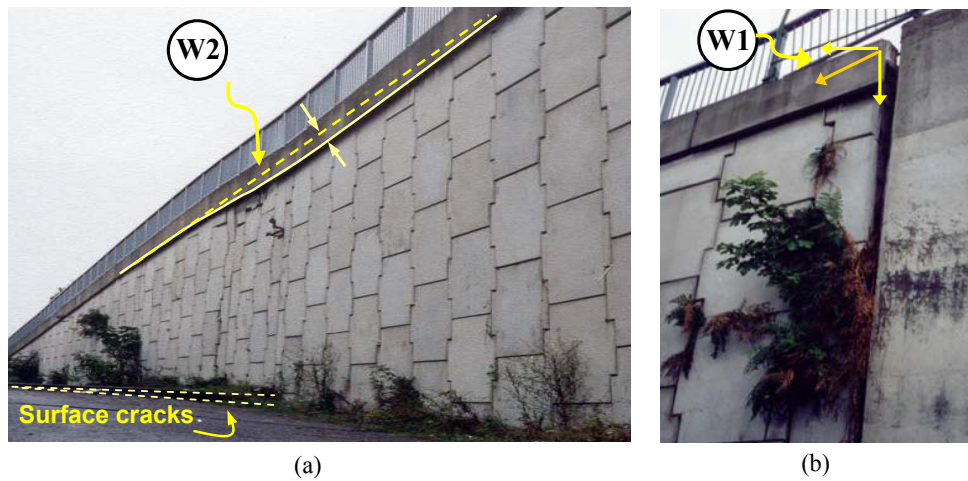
Damage details on the western wall face (photos after Ozbakir).
